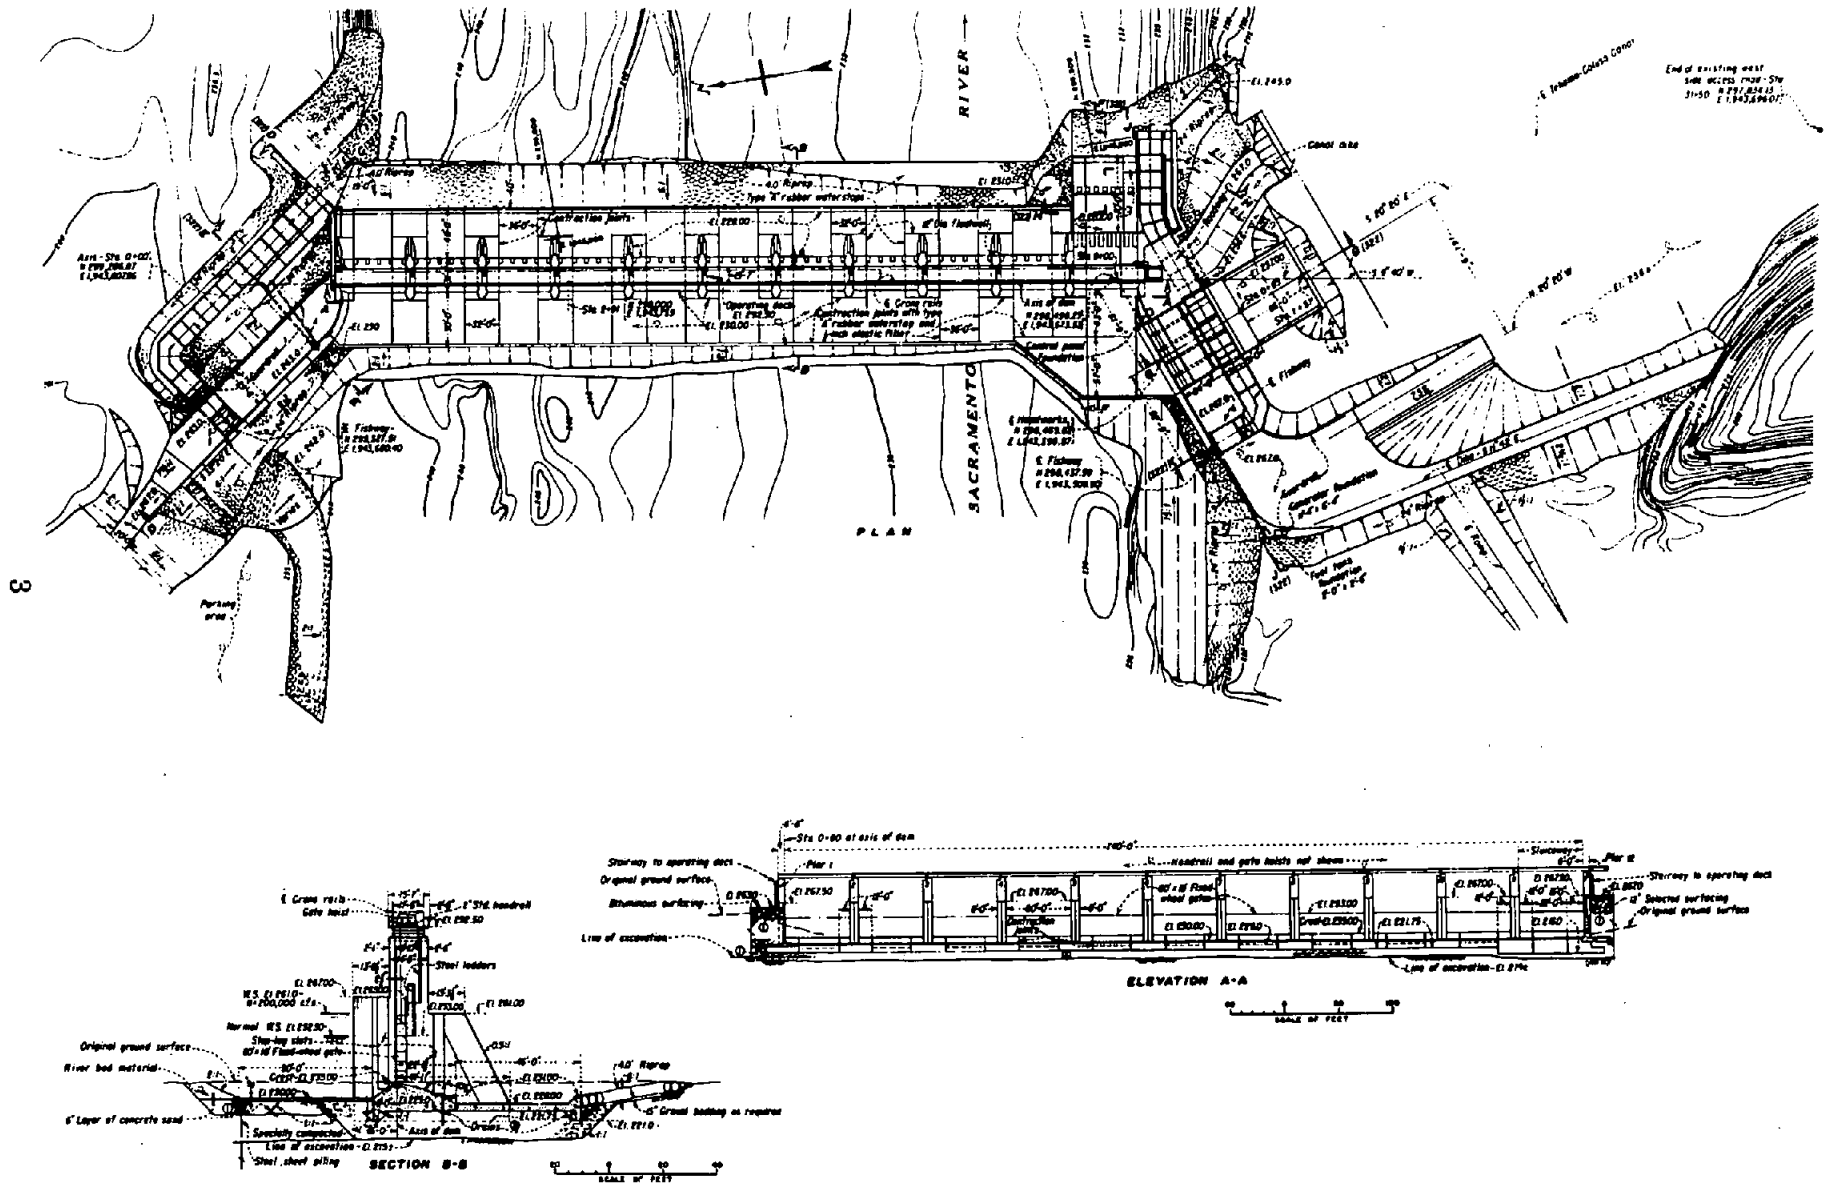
Plan and elevation details for Red Bluff Diversion Dam.
